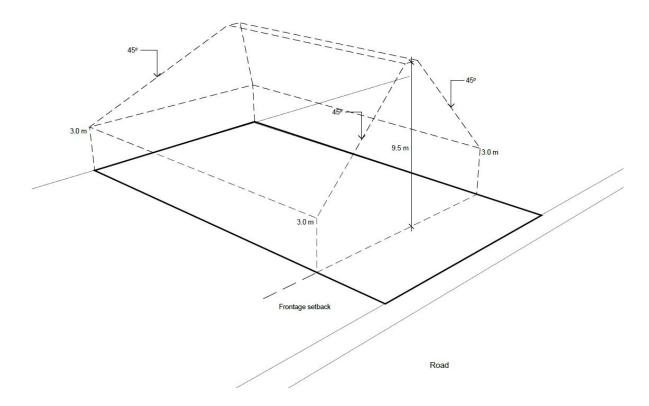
Building envelope as required by clause 9.4.2 A3(a) and clause 9.5.1 A2(a)
